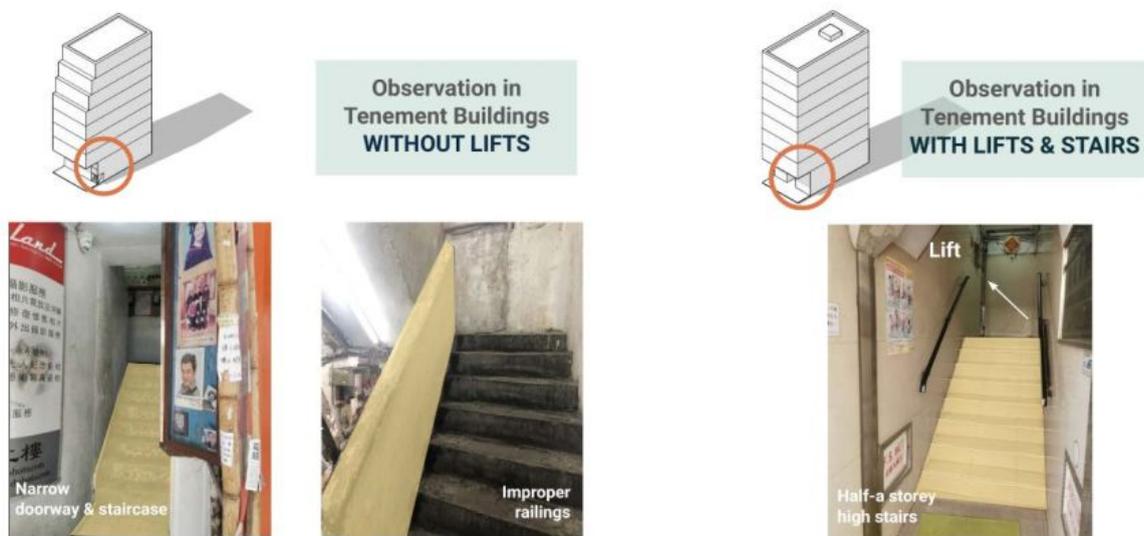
Poor Conditions Observed in Tenement Buildings
